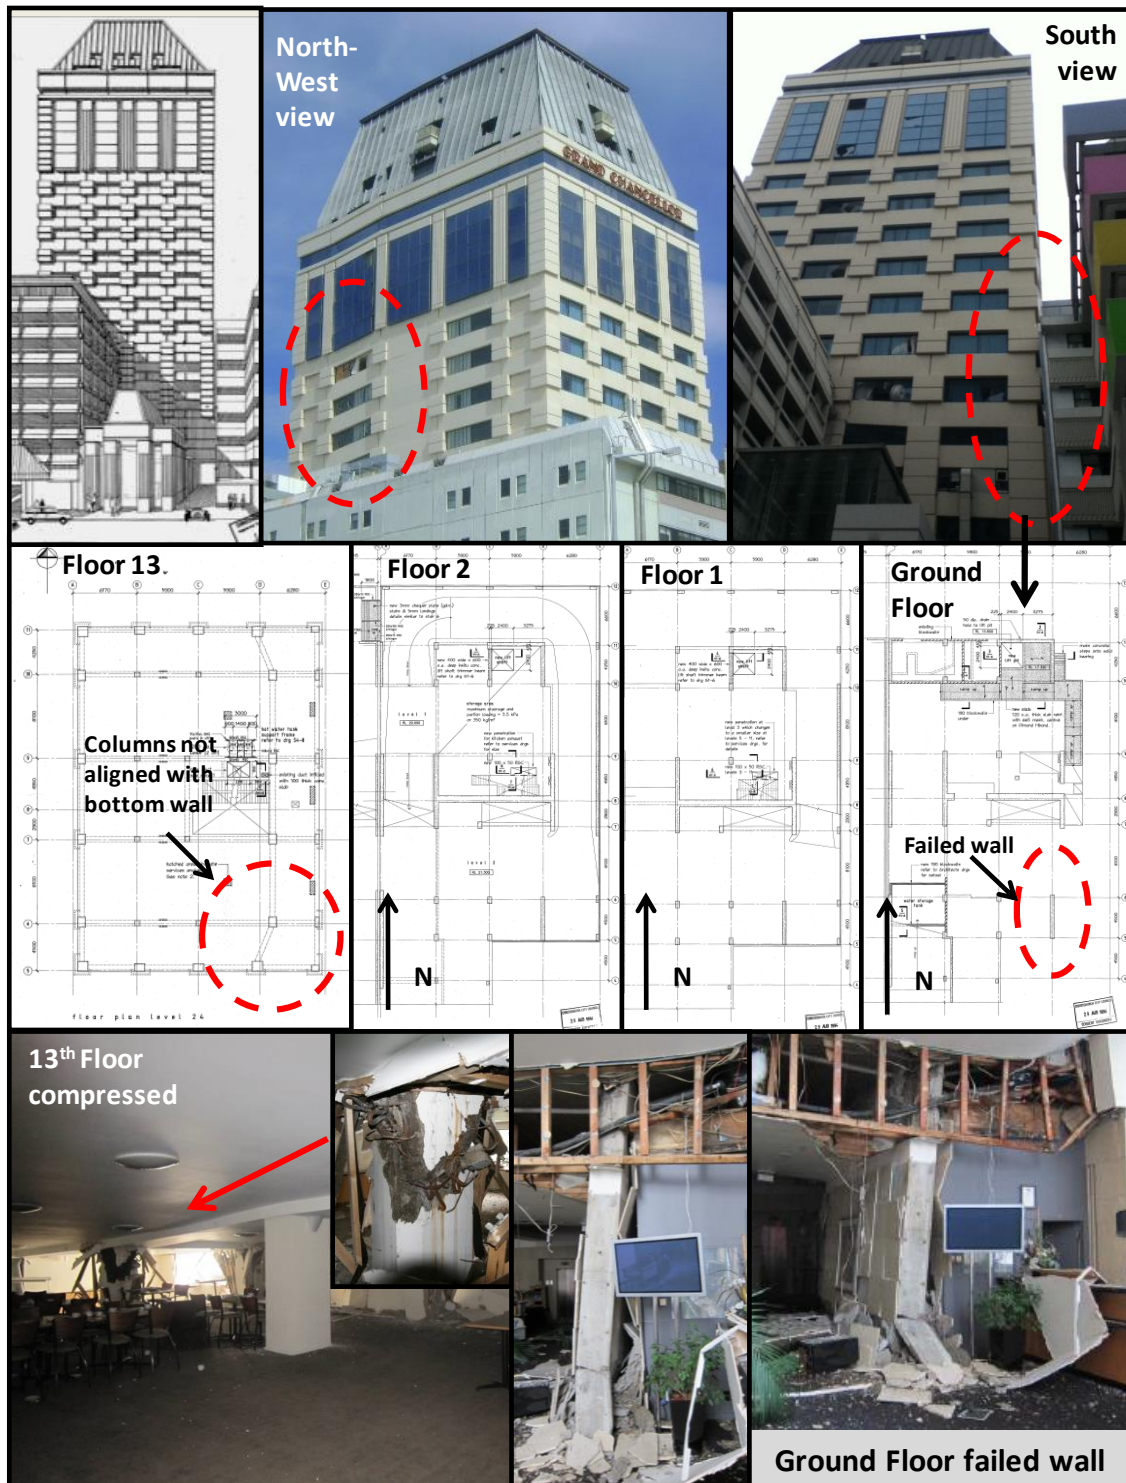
Building F (28 storeys): partial collapse due to failure in corner ground level RC wall (bottom pictures courtesy of Professor Nigel Priestley).
